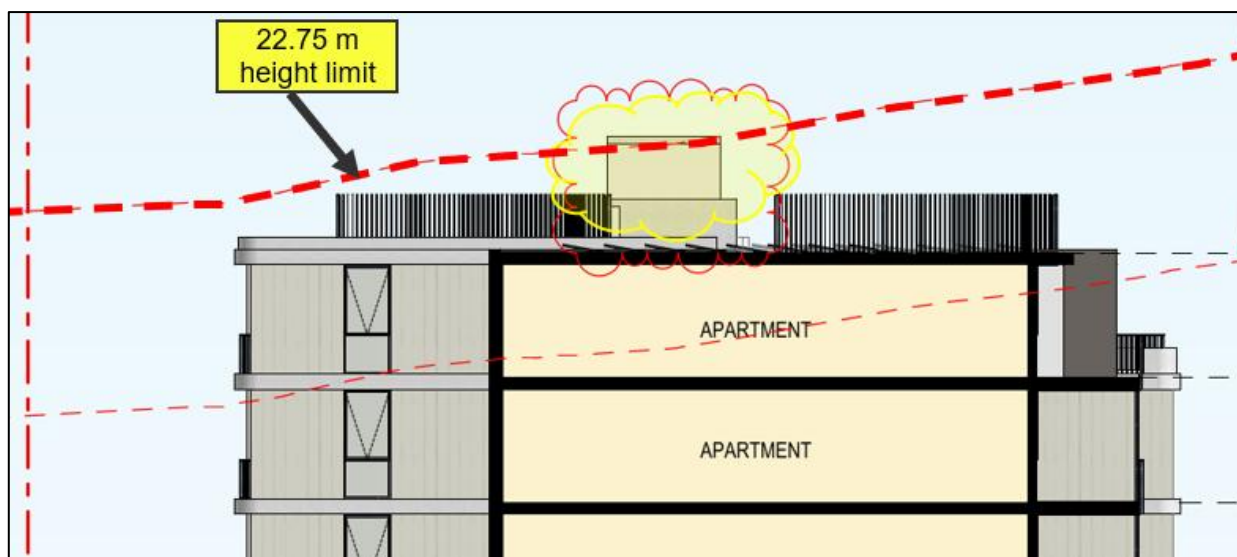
| Elevation showing building element which exceeds the building height (base source: Applicant's modification report)
